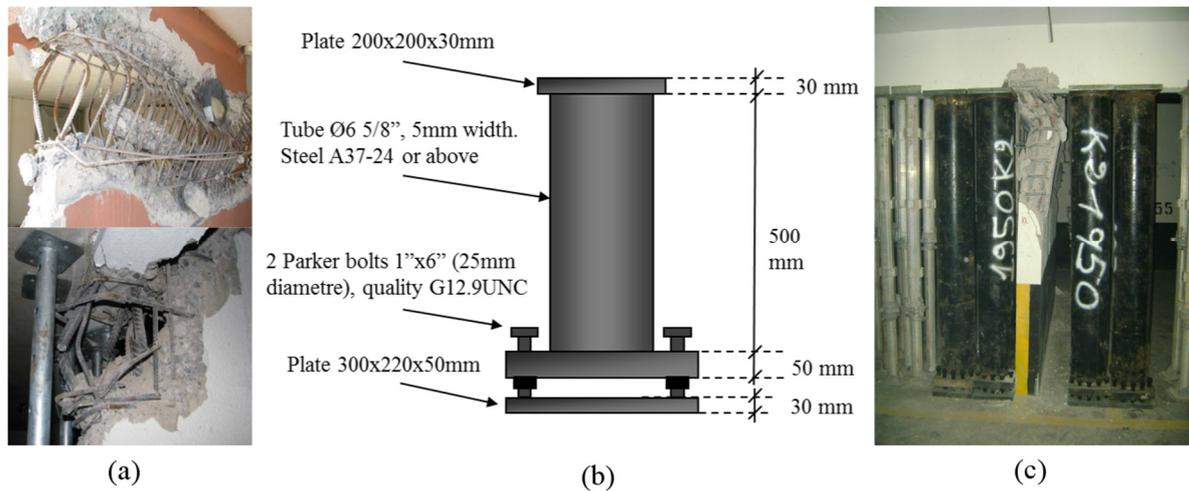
Damage and shoring system: (a) boundary damage and temporary shoring; (b) Yoder pipes and stabilization solution typically used for buildings; and (c) implementation of the stabilization solution at the basement level of a building in Santiago
